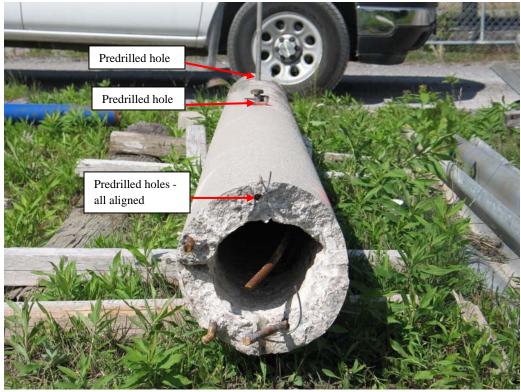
Rusted rebar – Due to predrilled hole and exposure to weather
